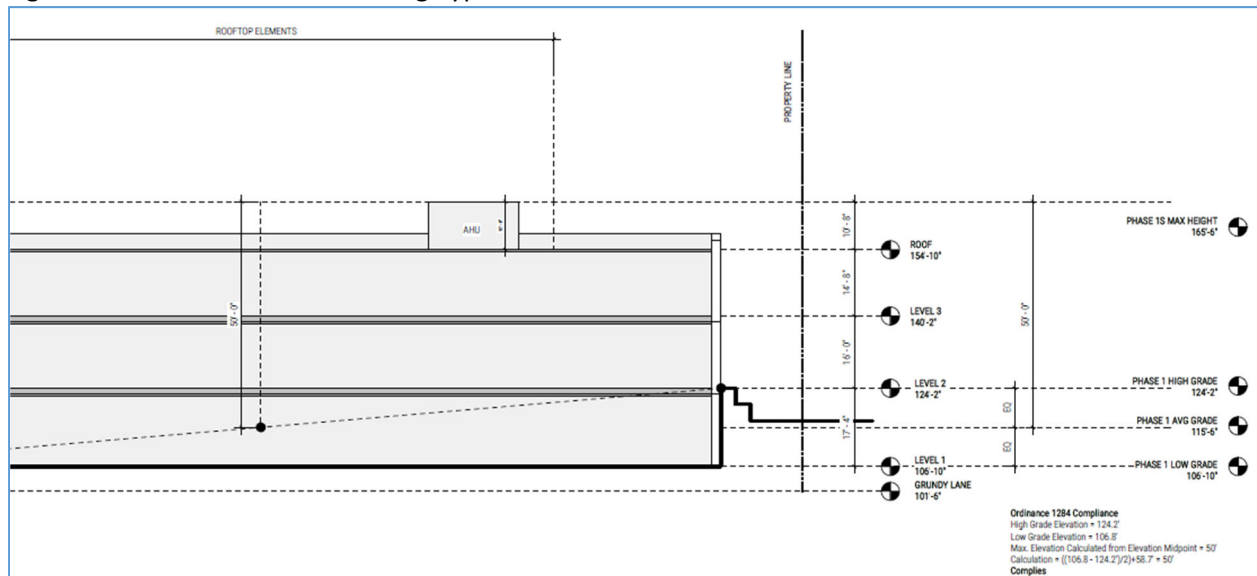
YouTube Phase 1 Building Massings Looking Southeast
